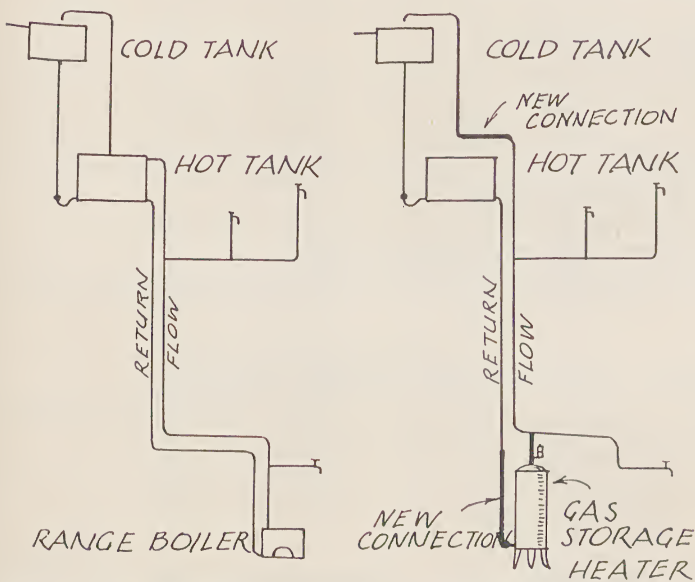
(Left) Existing tank system. (Right) Storage heater fixed in place of boiler.
